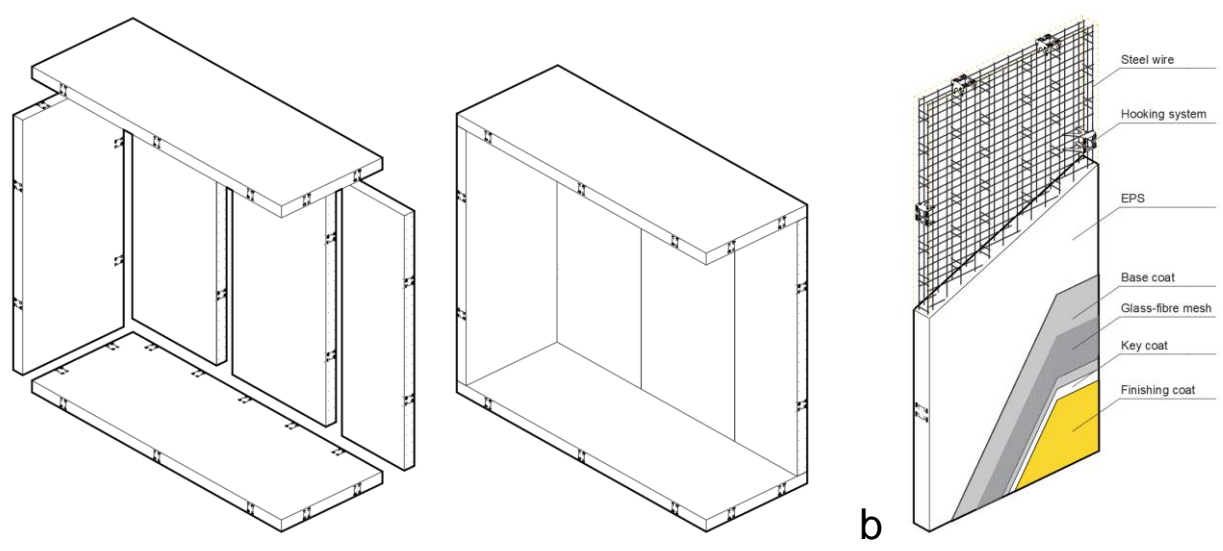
a) Axonometric view of the assembly process of reinforced-EPS panels; b) axonometric view of reinforced-EPS panels adopted in this study with the description of the multi-coat rendering system.
